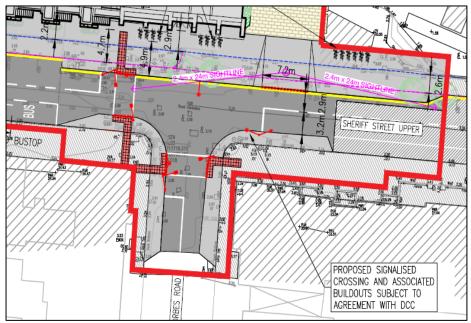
Proposed Sheriff Street Upper / Castleforbes Road Upgrades
